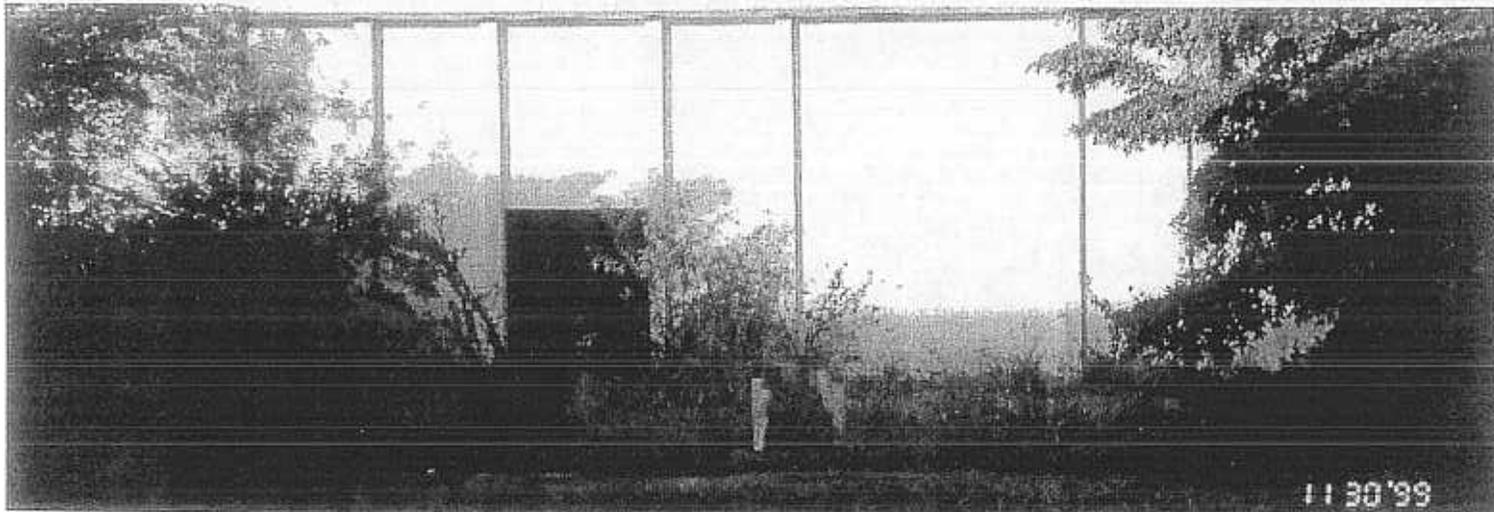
, site viewed from the north, Australian Pines are in the pond and in front of the building, 11/30/99.
